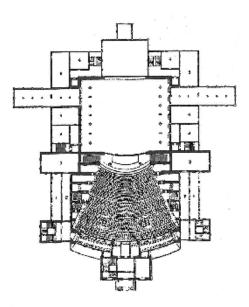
(Mullin, 1970) A plan of the Bayreuth Opera House (1896)
